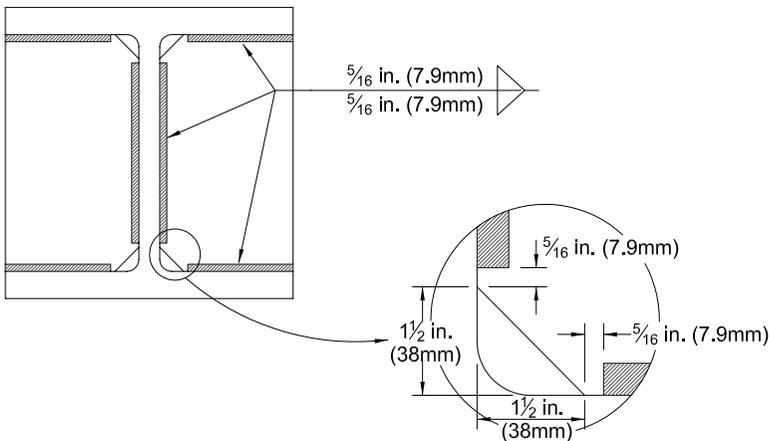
Recommended placement of stiffener fillet welds to avoid contact with “*k*-area.”
